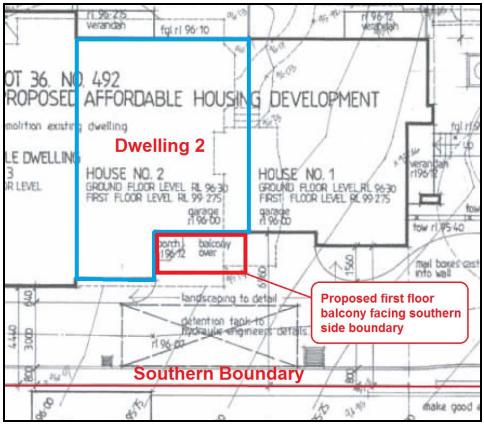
Elevation plan extract showing the proposed upper level side facing balcony that is considered to present opportunities for overlooking of adjoining property at 490 Blaxland Road and subsequent loss of privacy. It is noted that the Ryde DCP 2014 prohibits balconies on multidwelling housing developments.
